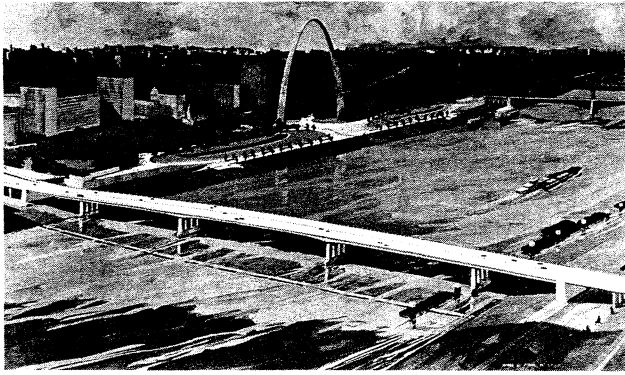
Perspective of Poplar St. Bridge with arch in background
